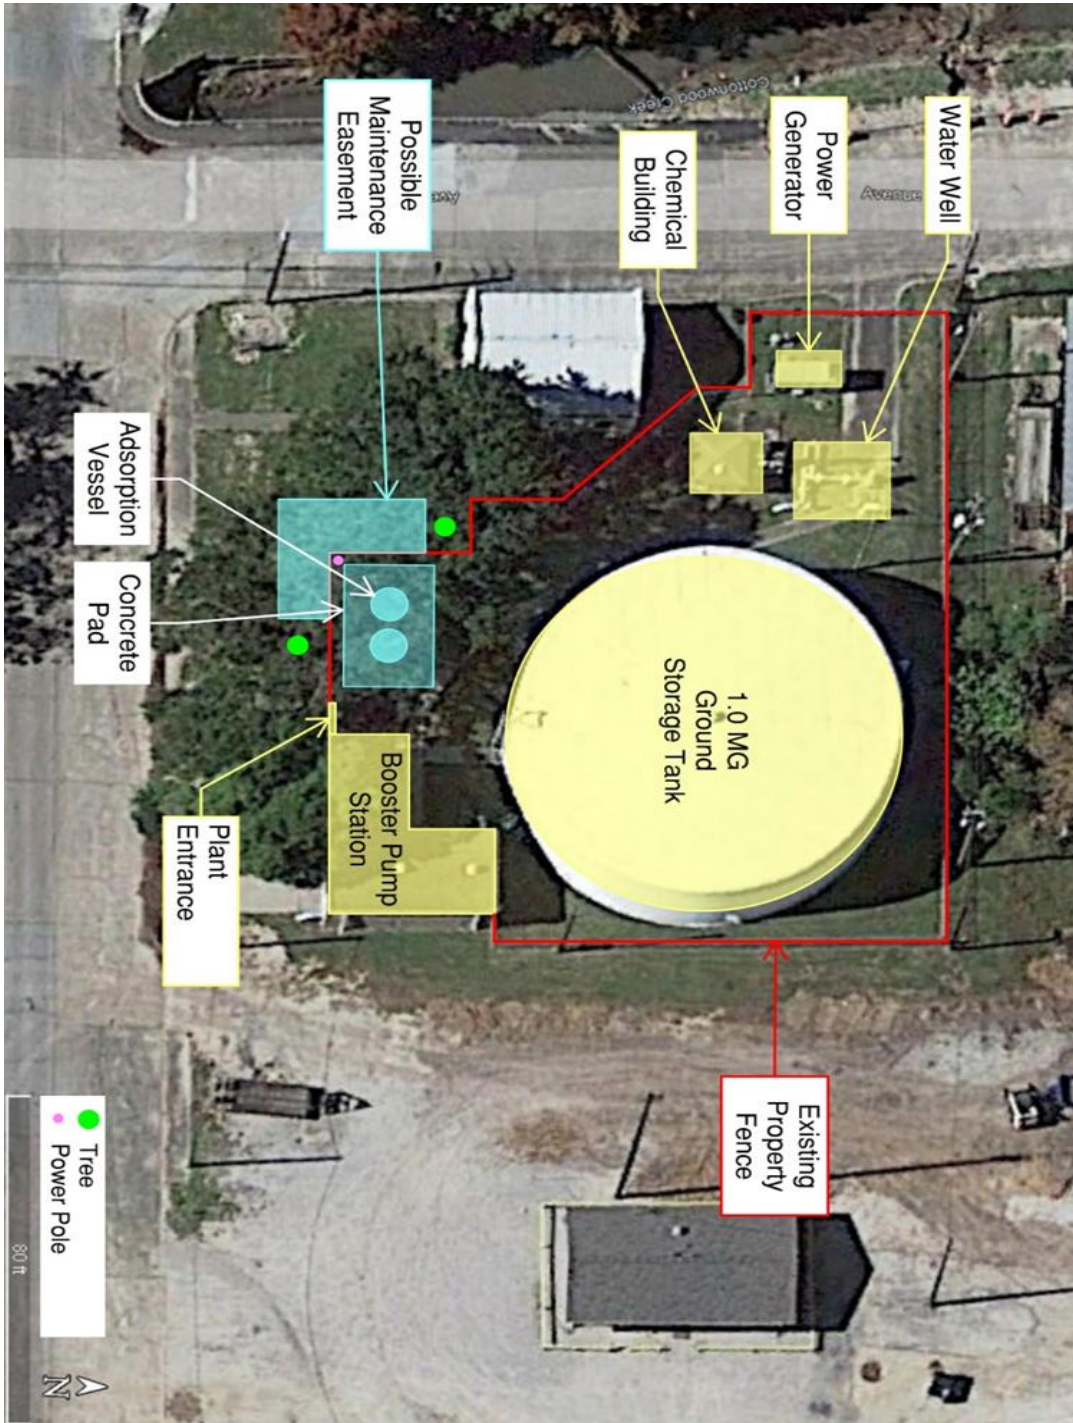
6th Street and Avenue I WTP Proposed Adsorption Treatment System Site Layout Alternative 1
